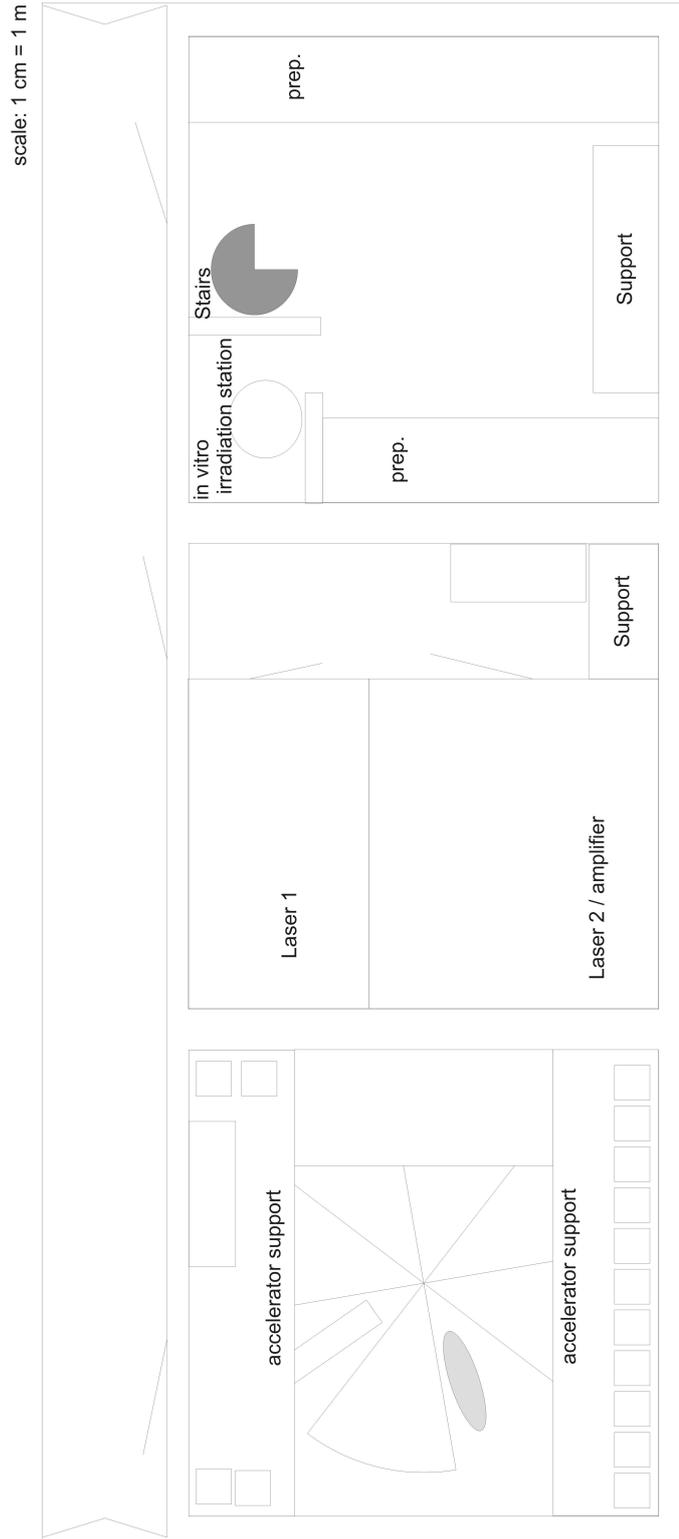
Possible layout of the mezzanine level of the ICCT accelerator facility. Crane access to the FFAG is provided by limiting the mezzanine floor to one third of the span. The mezzanine floor holds the laser and its power supply and sample preparation rooms. The in-vitro radiation area and stairs to the basement level are also indicated.
